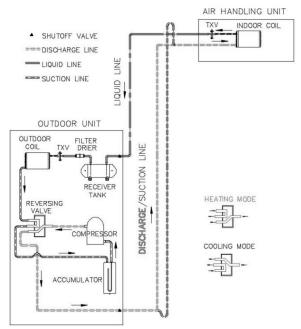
Heat Pump Piping Schematic of Heating Mode in Double Riser
